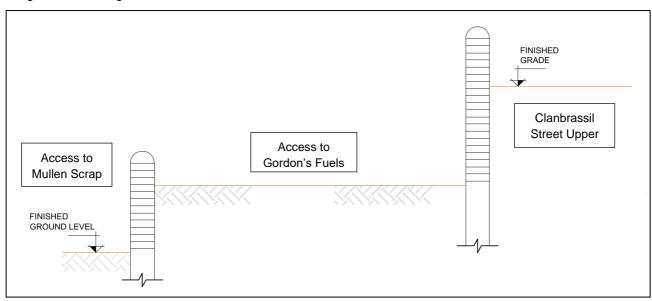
Cross Section Through Existing Accesses and Retaining Walls at Gordon's Fuels and Mullen Scrap
